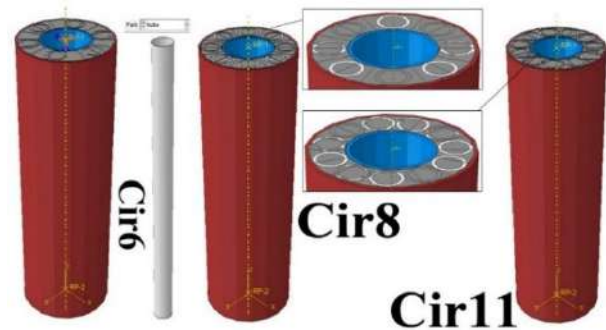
Example of a concrete filled double shell steel column with global circular stiffener (examples "Cir6", "Cir8" and "Cir11").
